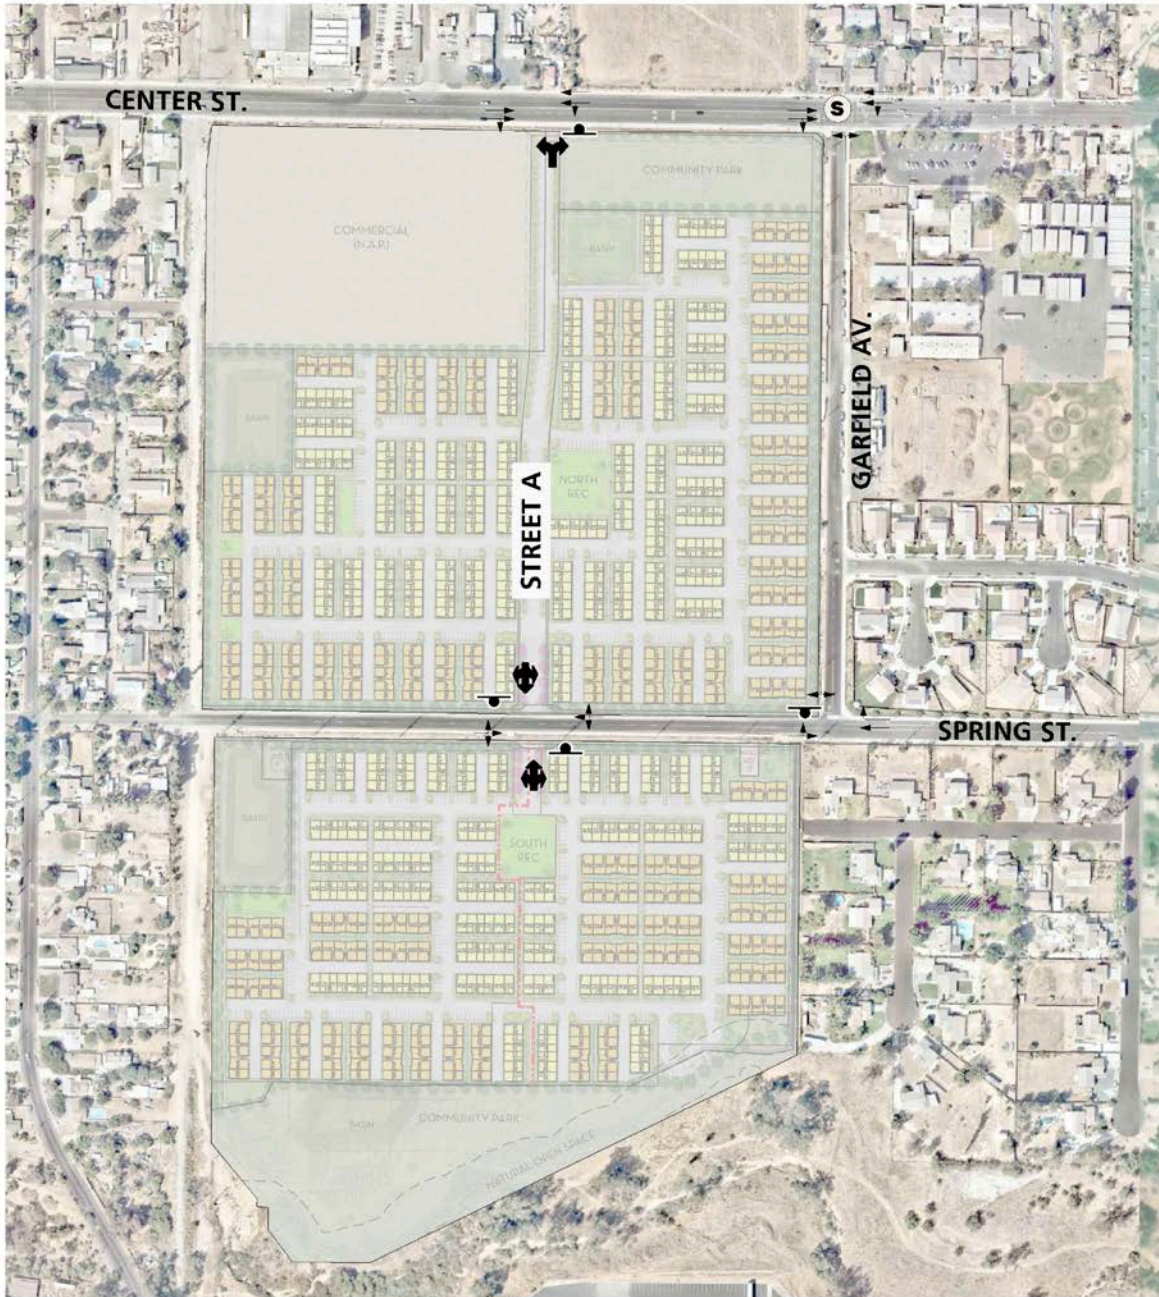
ON-SITE AND ADJACENT TRAFFIC IMPROVEMENTS
